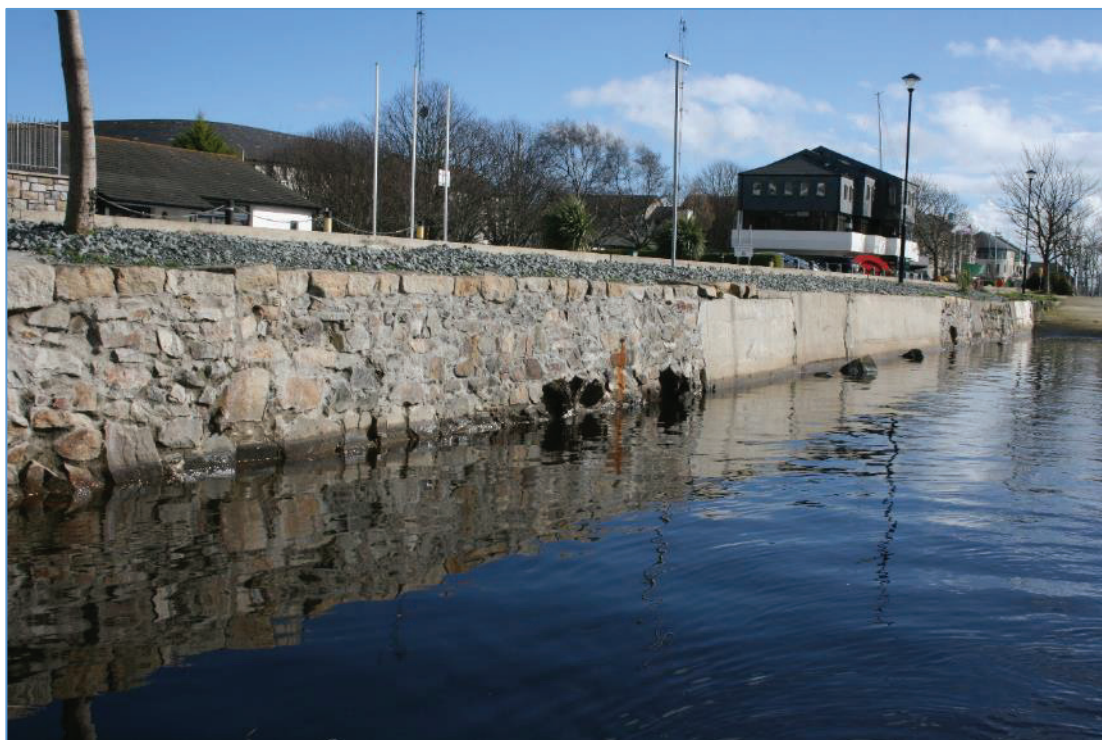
View along the North Quay stone wall showing patches of repair and replacement by concrete.
